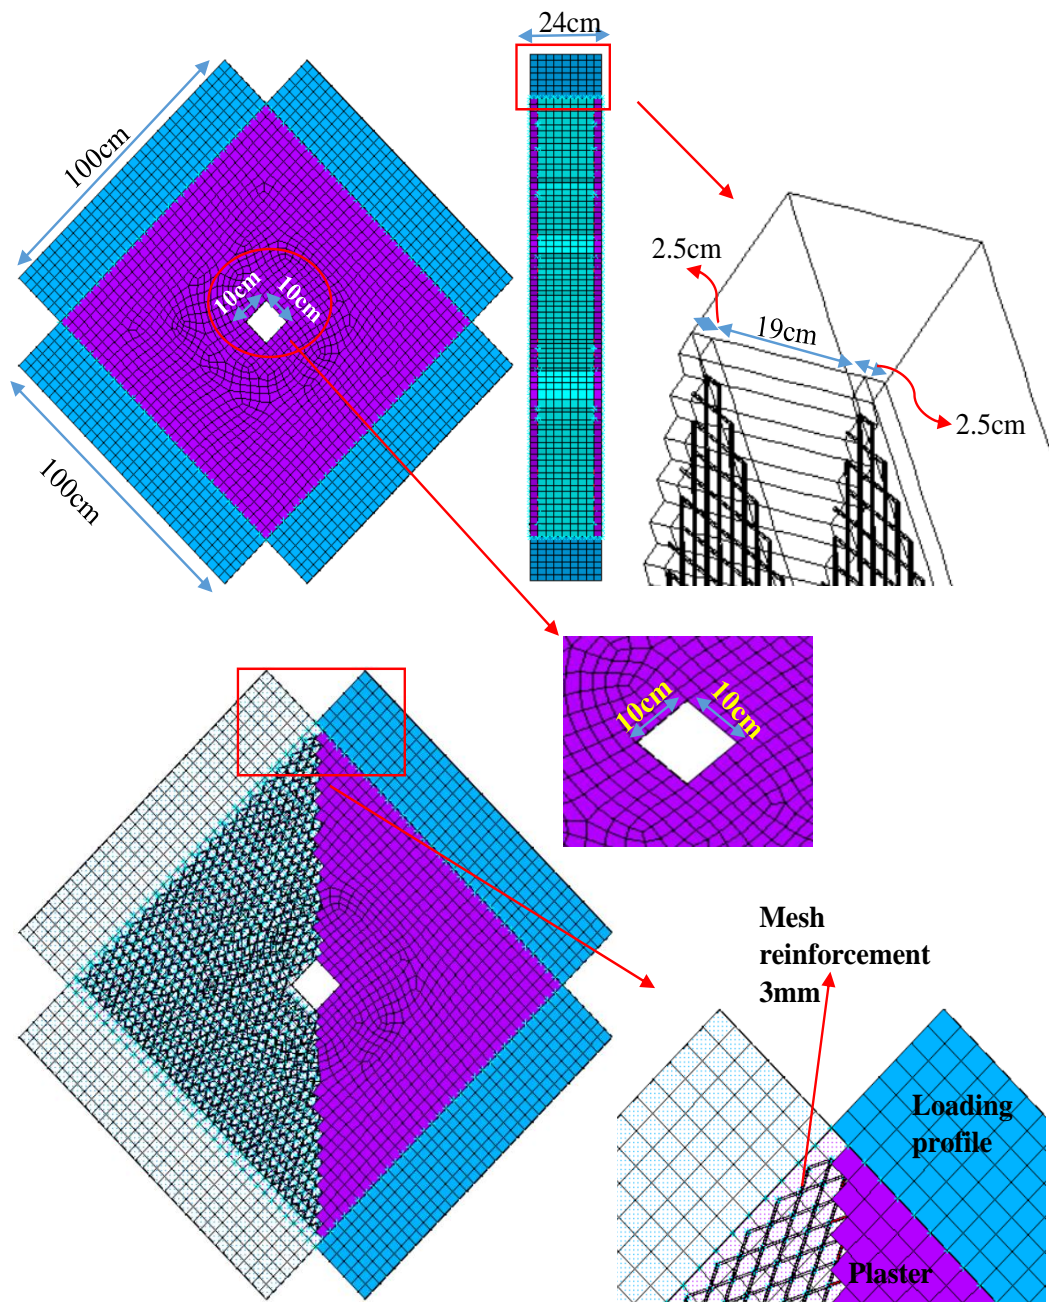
10% opening ratio of the masonry wall model-3.0mm mesh reinforcement
